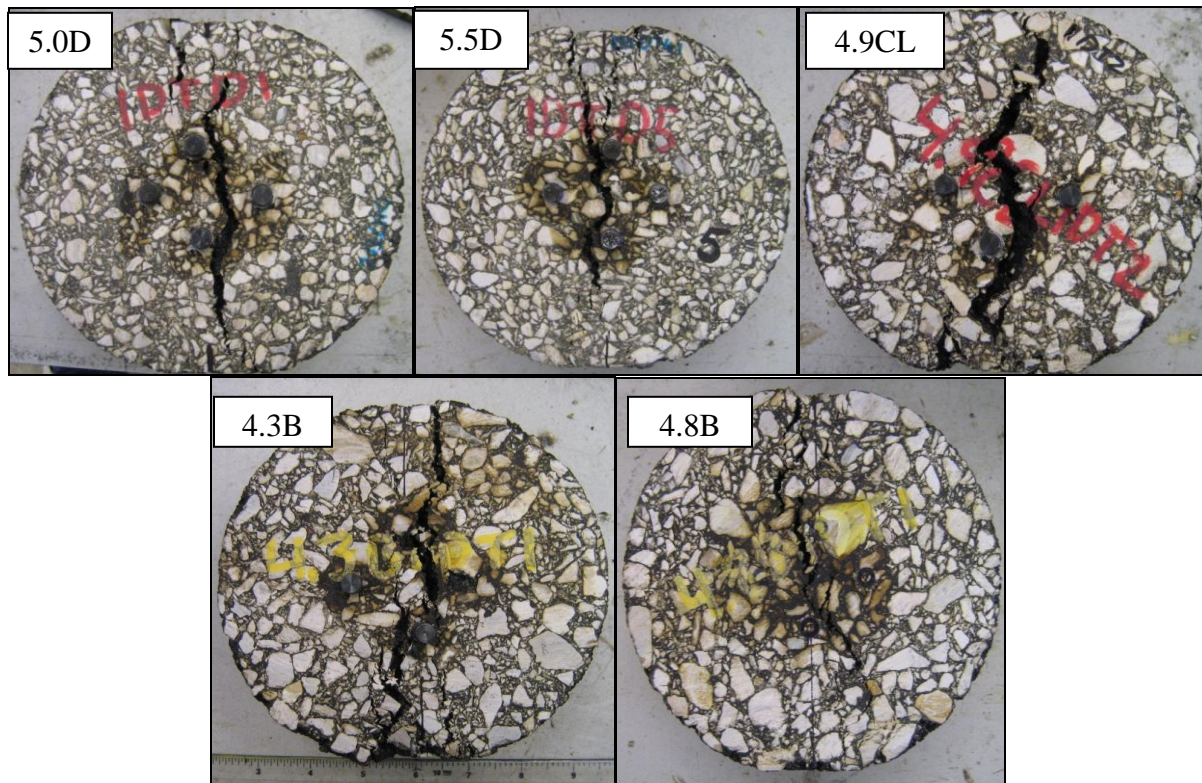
Example of Typical IDT Crack Failure with Respect to Each Mix Type
